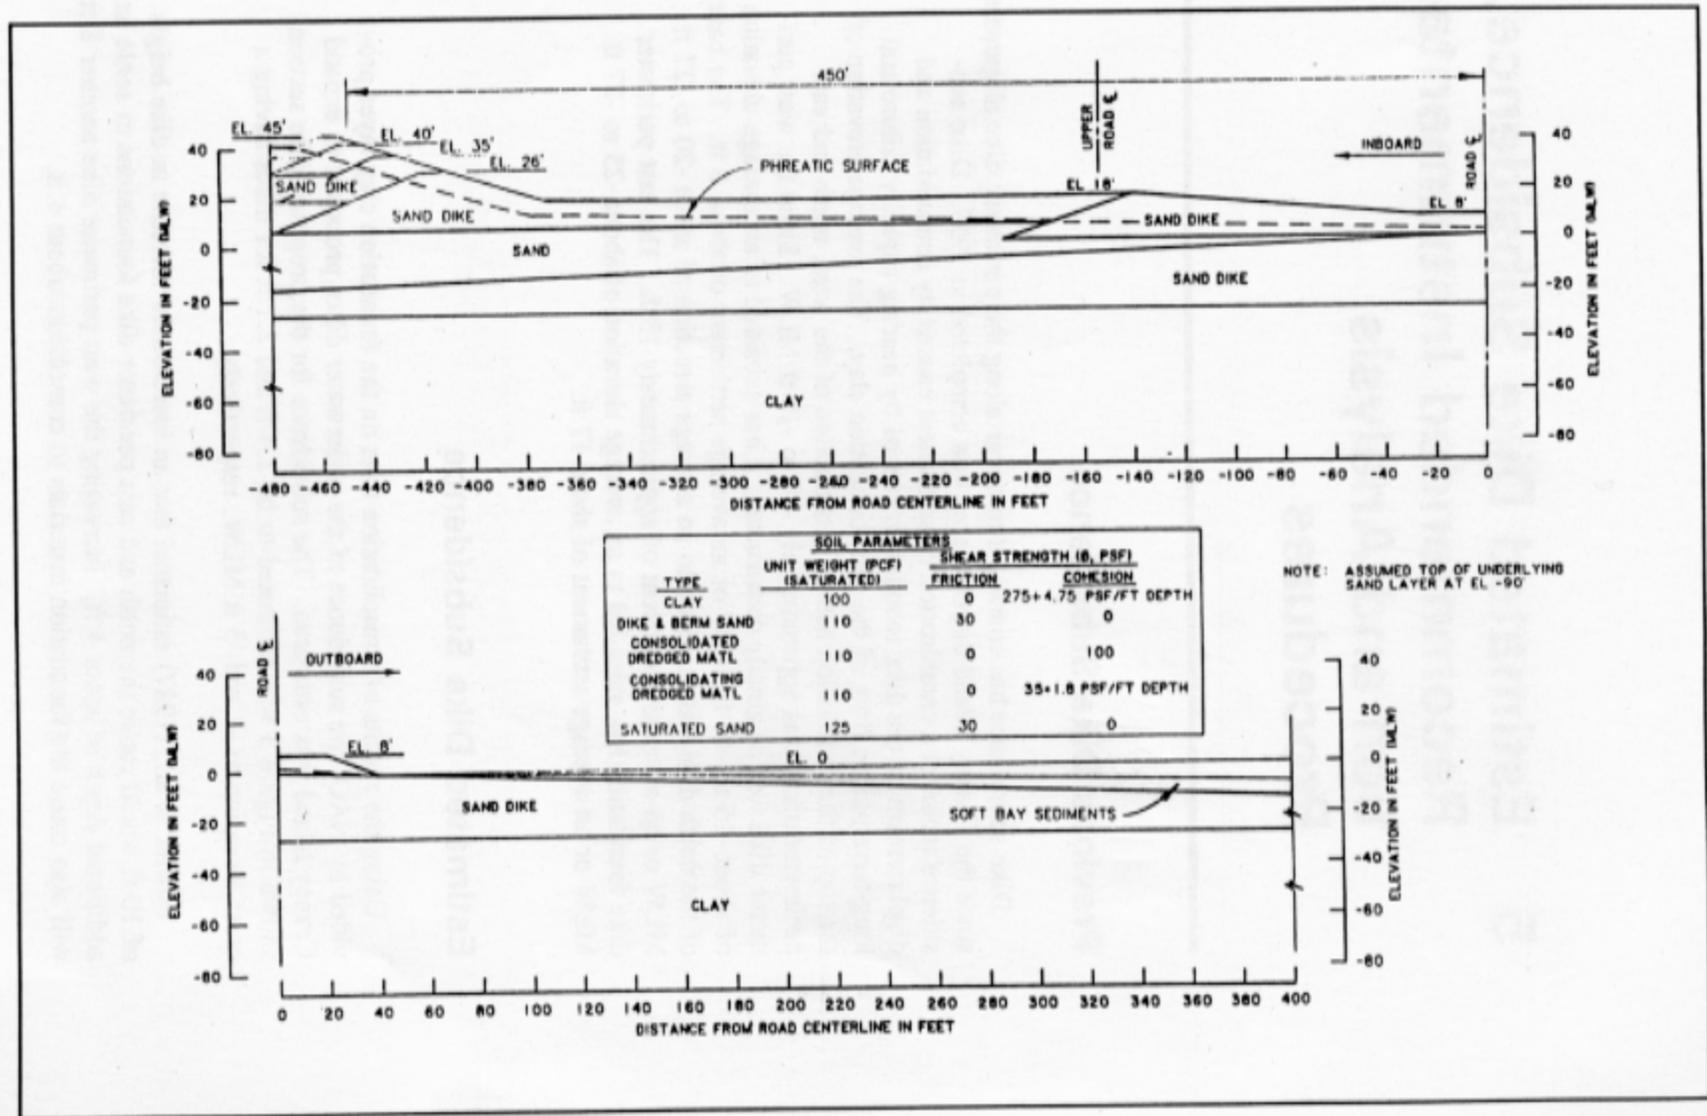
East perimeter dike cross-section raised to elevation +45 ft MLW
